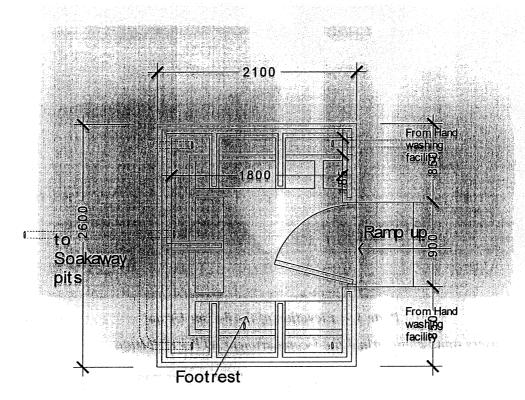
The Floor Plan of the 6-Users Stand Alone Urinal
